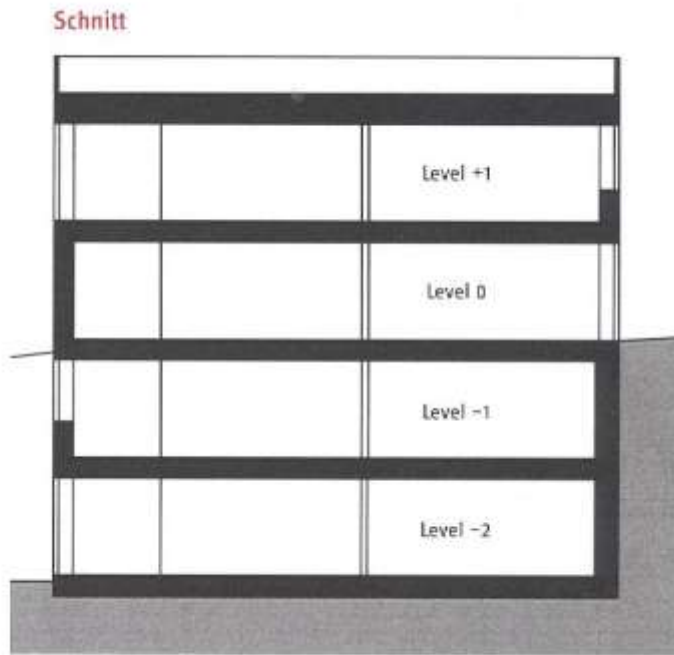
Section (source: Cukrowicz Nachbar Architekten ZT GmbH 2008)
